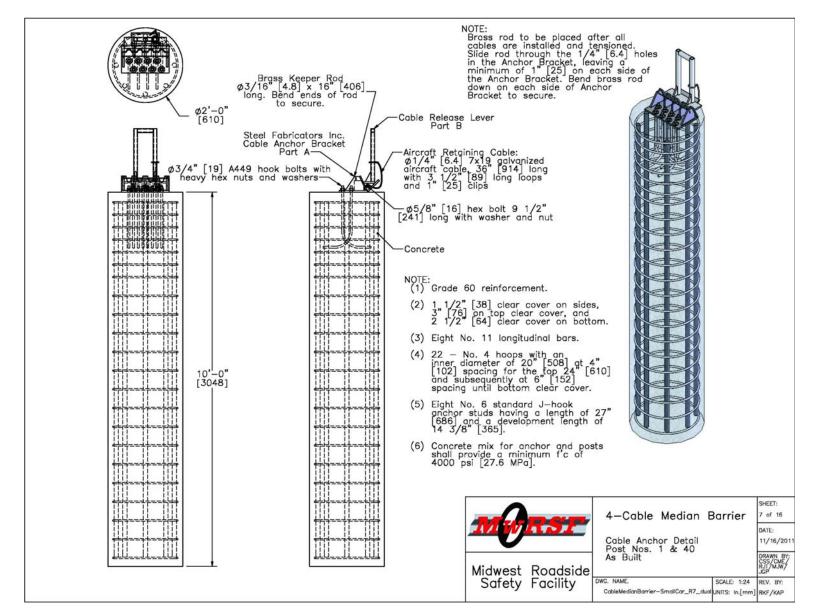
Cable Anchor Details, Post Nos. 1 & 40, Test No. 4CMB-2
